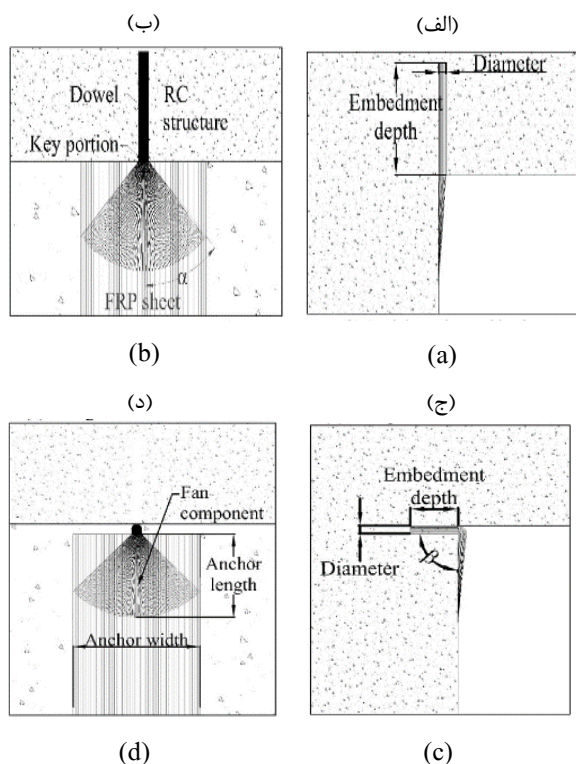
Straight anchors and bent anchors: (a) Straight FRP anchors-side view; (b) Straight FRP anchors- front view; (c) bent anchors-side view; (d) bent anchors- front view [2]
